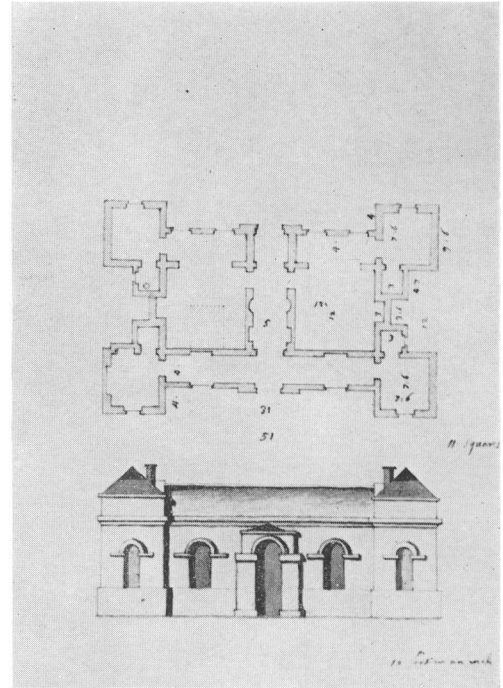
Plan and elevation of a small one-storey house* [102]
